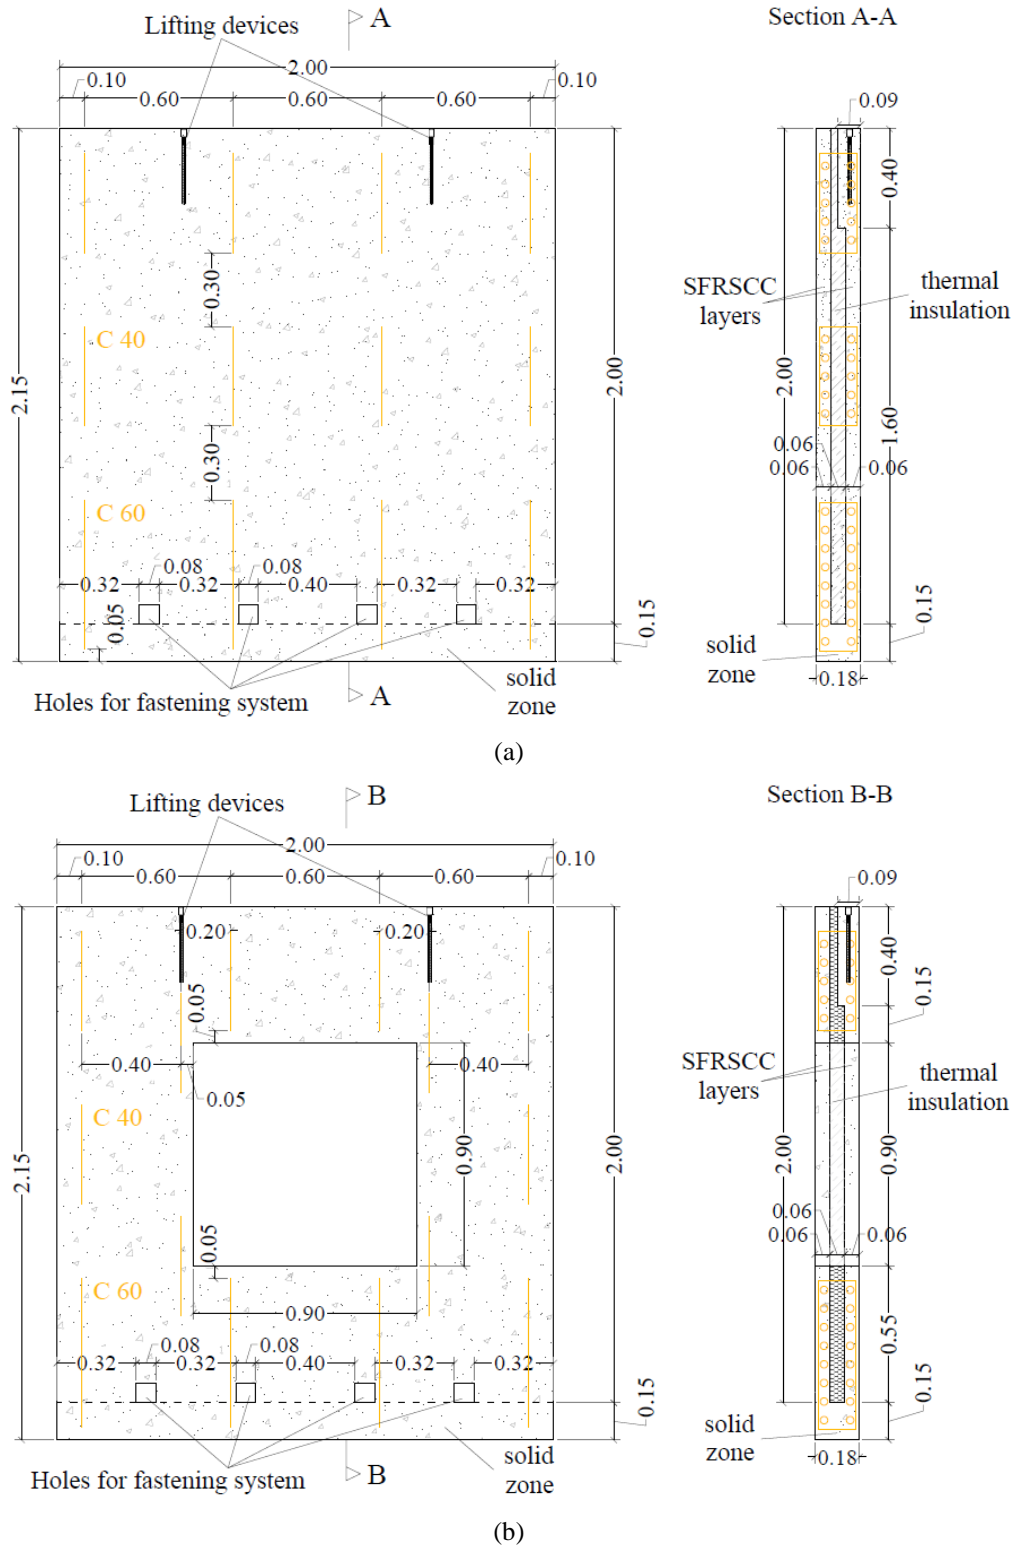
Details of the prototype (a) without opening and (b) with opening (dimensions in m).
